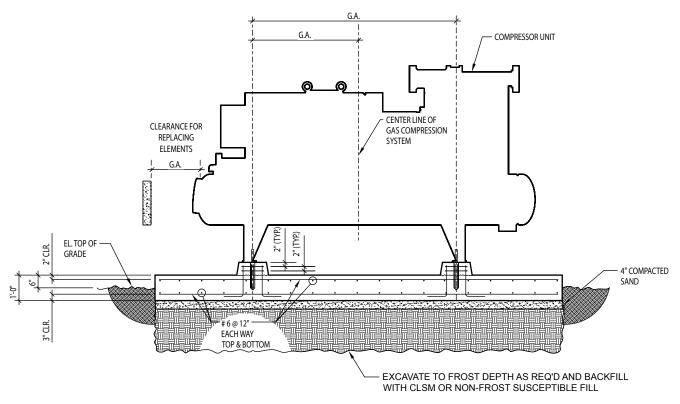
Concrete Pad with Compressor Unit Dimensions - Side View
